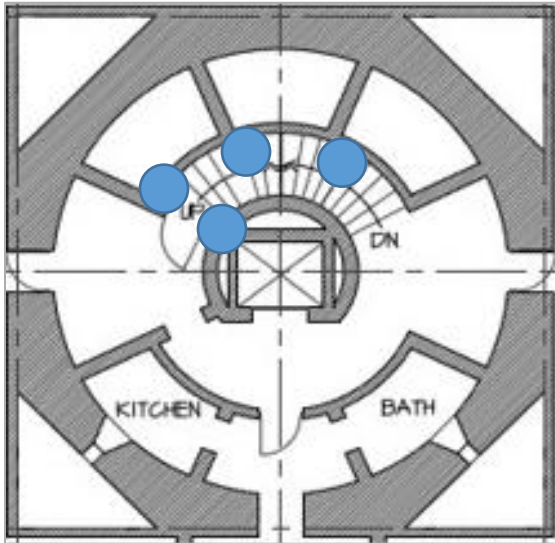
Location of observed efflorescence and other damages on the *Powell Street* mural.
